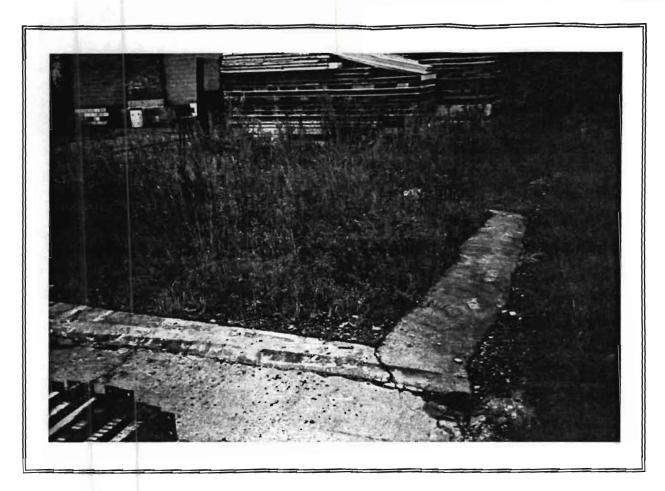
Former pit filled with soil/fill on the east side of warehouse building in the vicinity of the former pickling house.
